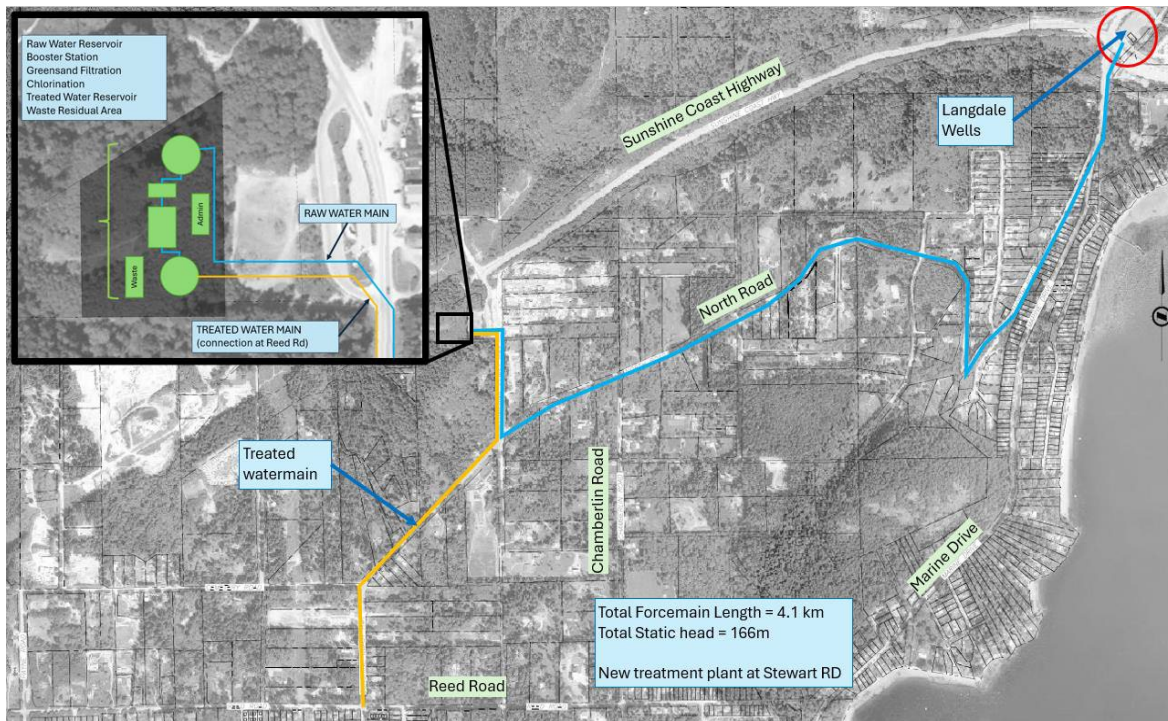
Alternative 5 – T-2 Langdale to Stewart Rd Plant via North Rd
